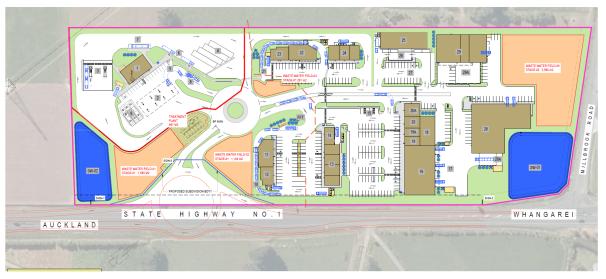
Extract from updated plans showing the Option 1 layout for the site (provided by client)
